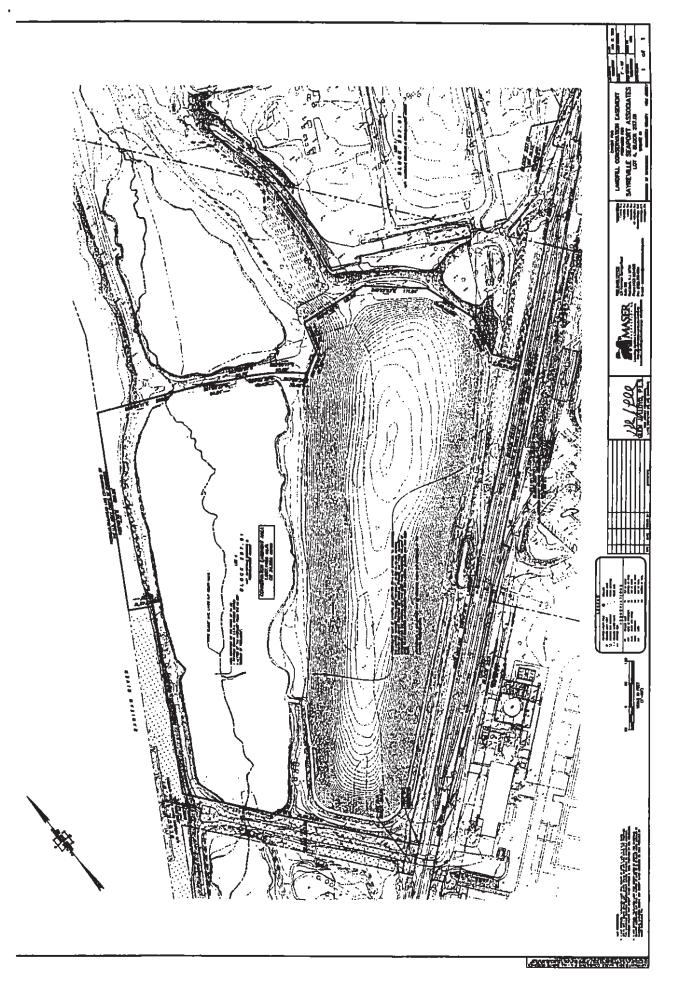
Plan of Conservation Area – Portion of Lot 4
